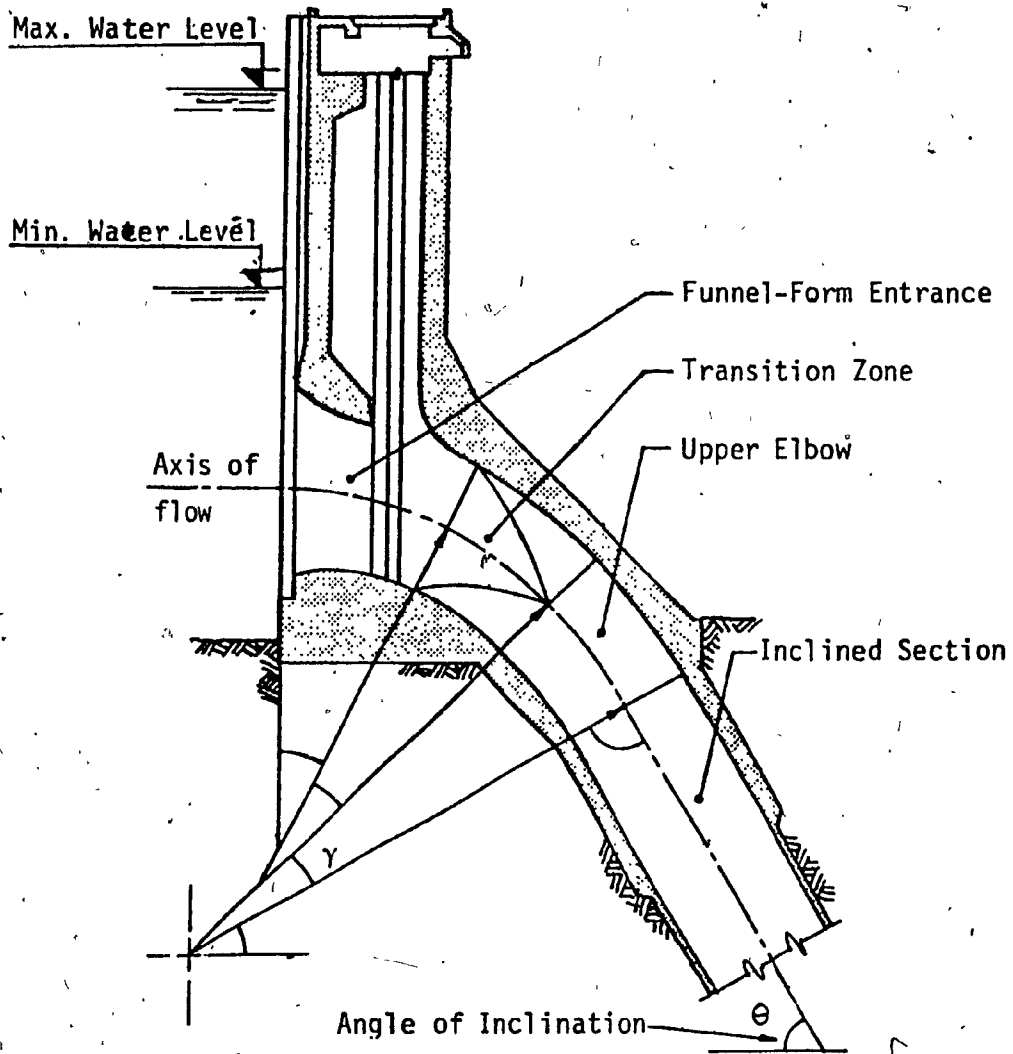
Section through a water intake structure showing an upper elbow and an inclined section of the penstock.
